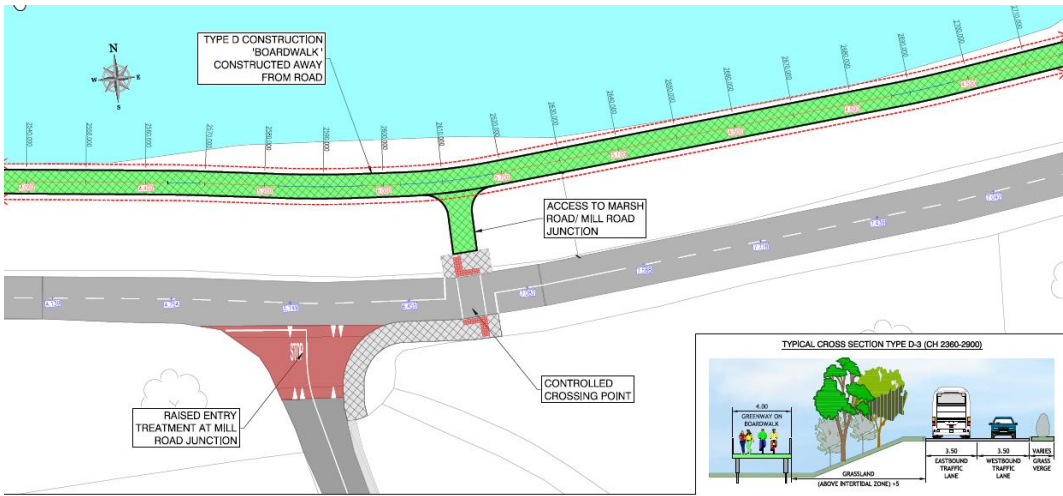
Proposed crossing from Boyne Greenway to Mill Road
